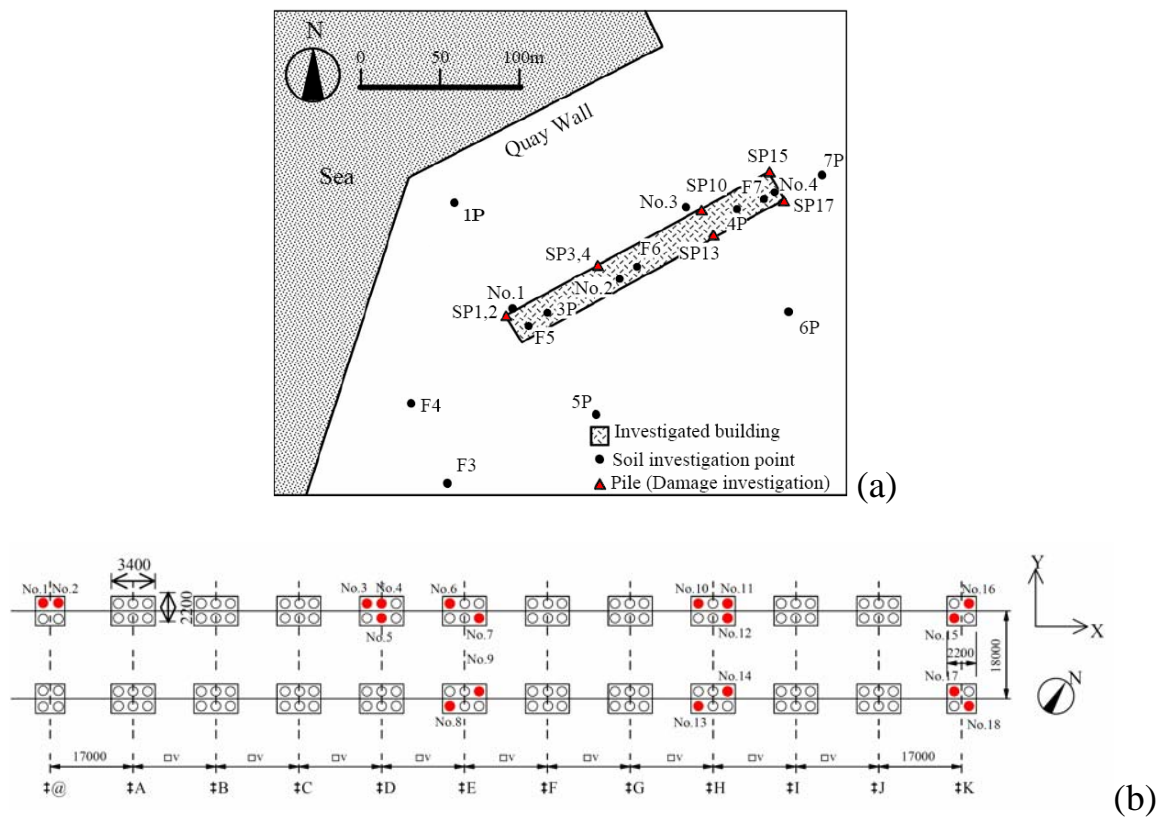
Plan view of the long 2-story structure investigated: (a) locations of building and soil investigation points; and (b) piles investigated (red dots) (Miwa et al., 2006).
